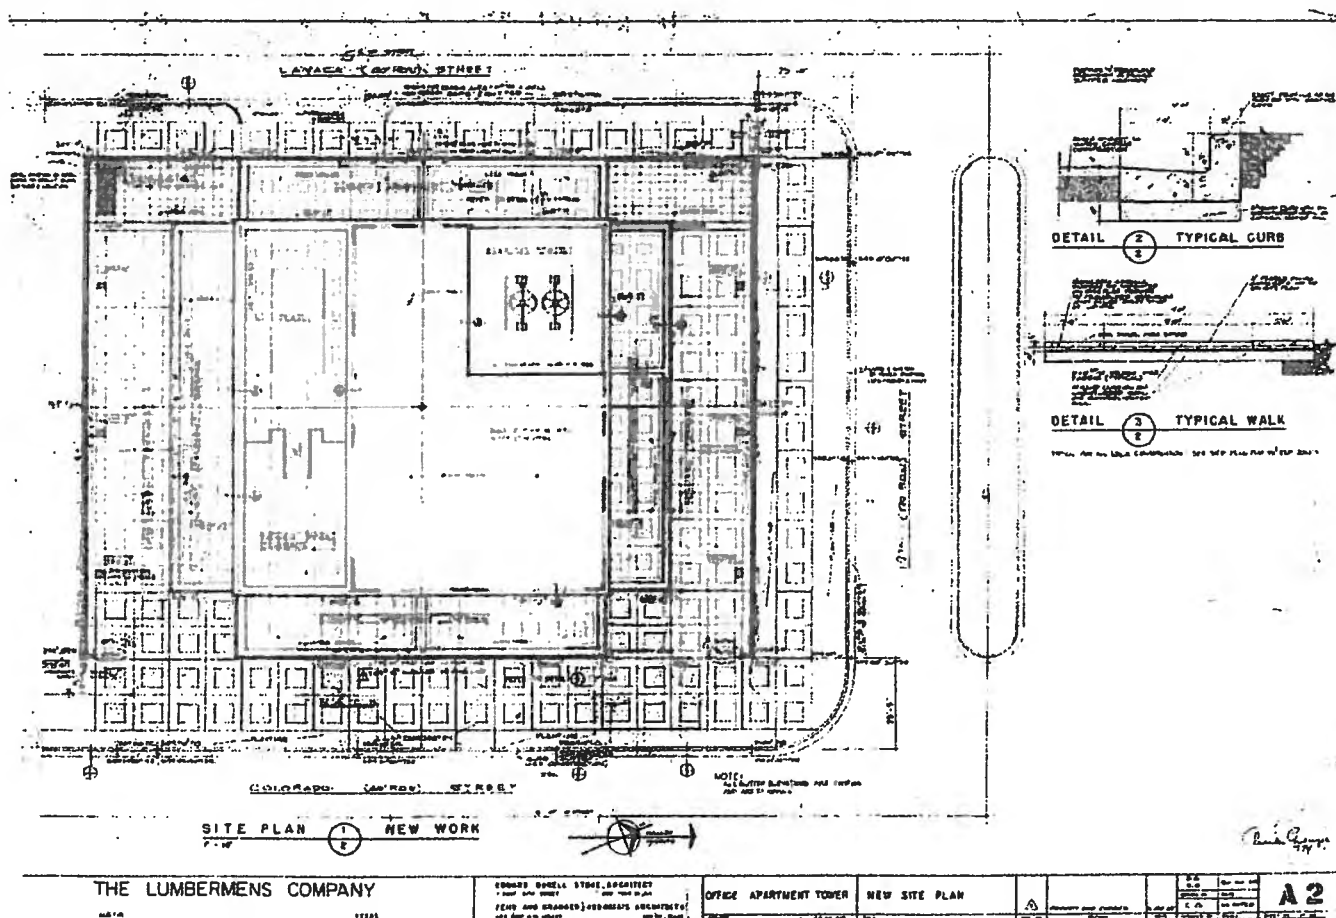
Site plan for the Westgate Tower, showing the patterned concrete at grade and at the Level 10 terraces.
